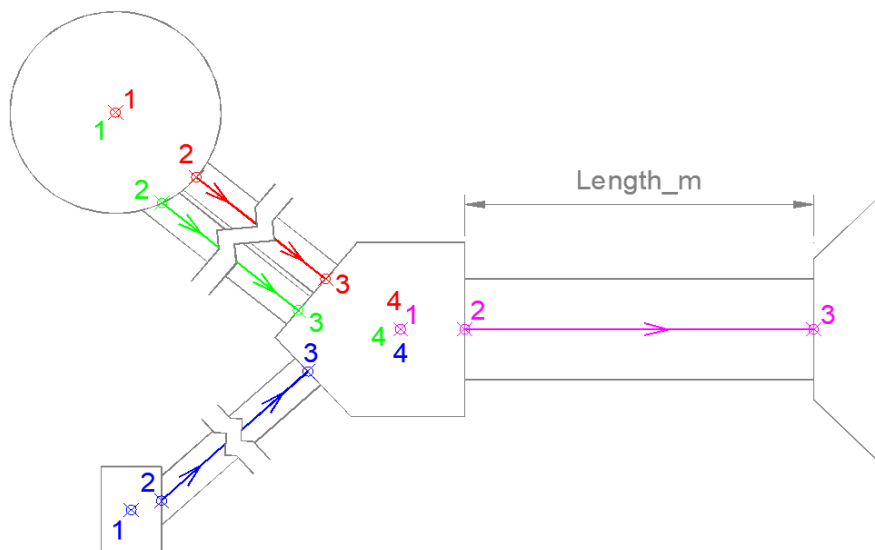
An irregular shaped pit with multiple multi-celled pipes entering the pit asset and a large single-celled asset exiting the pit with an outlet through an End Structure.
